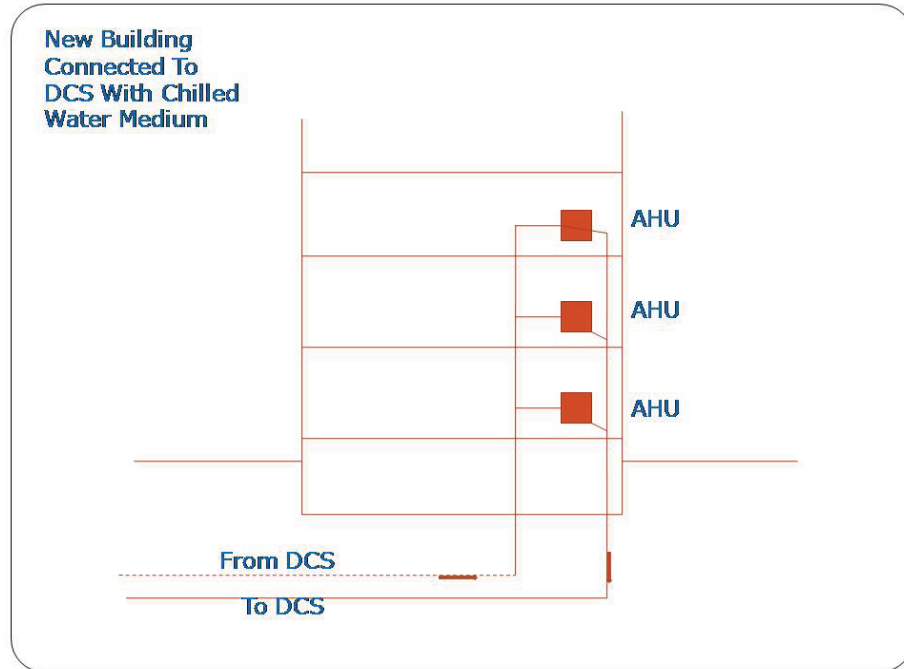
Schematic Sketch explaining new building connected to DCS with chilled water medium.
